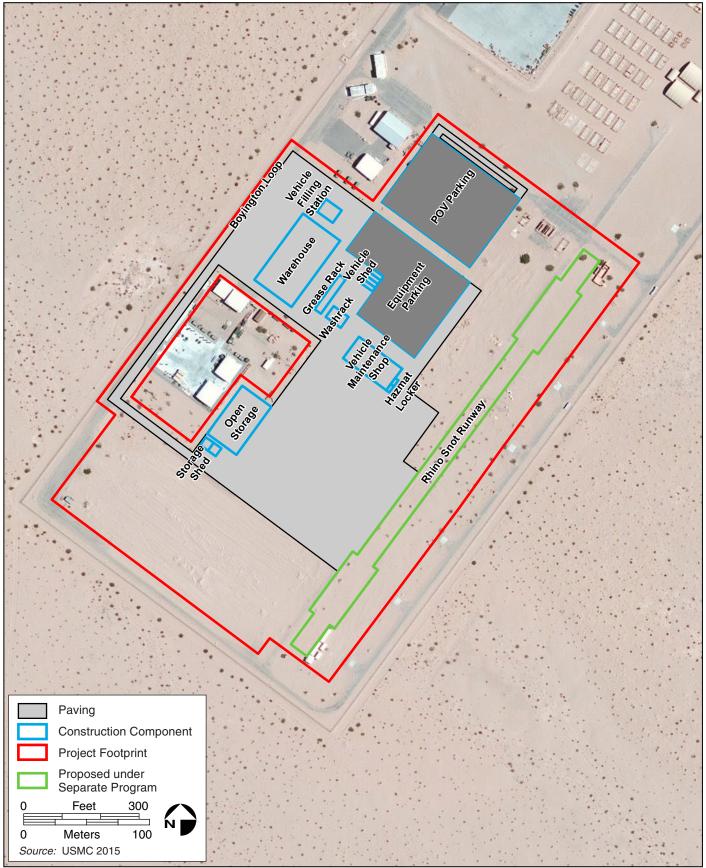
Alternative 2 - Canon Air Defense Complex Conceptual Project Layout
